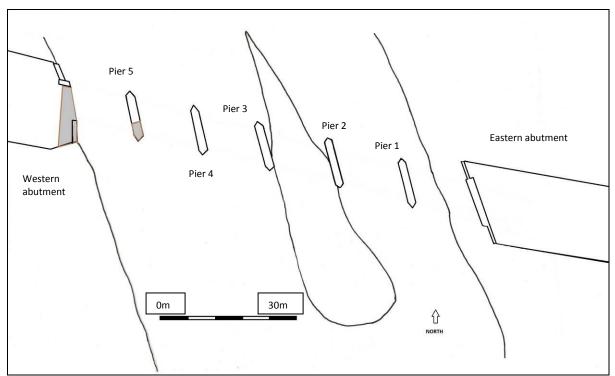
Plan of Ribton Bridge (No. 22). Grey outline denotes area lost to river erosion
